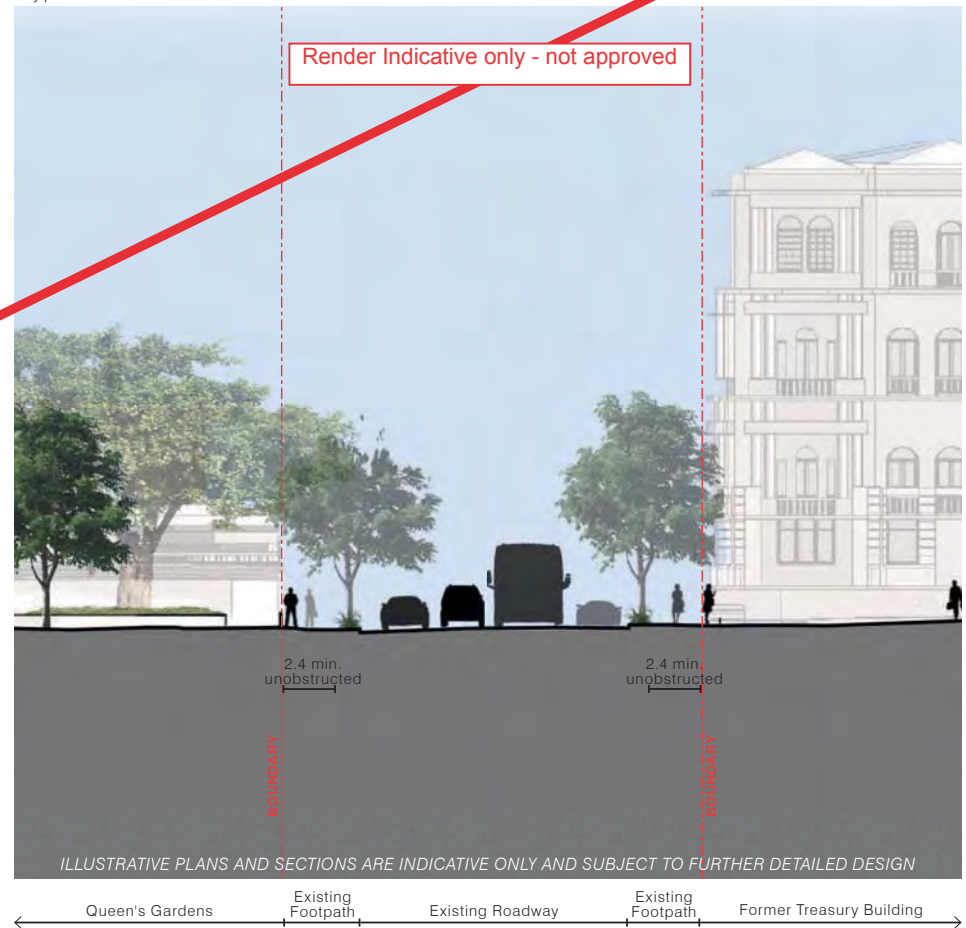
Elizabeth Street sectional elevation at North of Queen's Gardens and former Treasury Building
